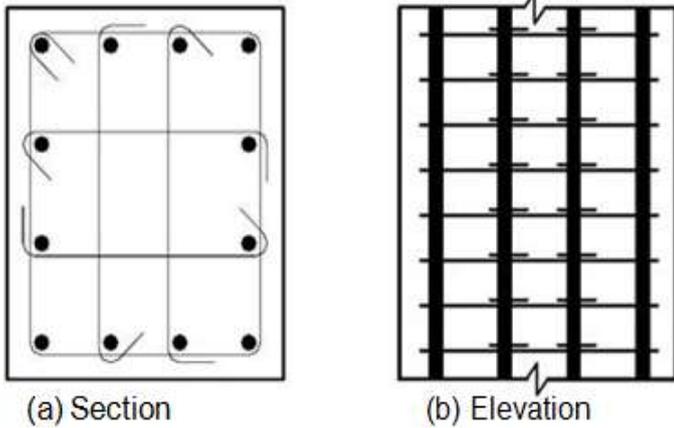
Hoops confined heavily stressed cross section of columns and beams, with a) hoops surrounding the core and supplementary bars, all of which are b) closely spaced along the member length.
